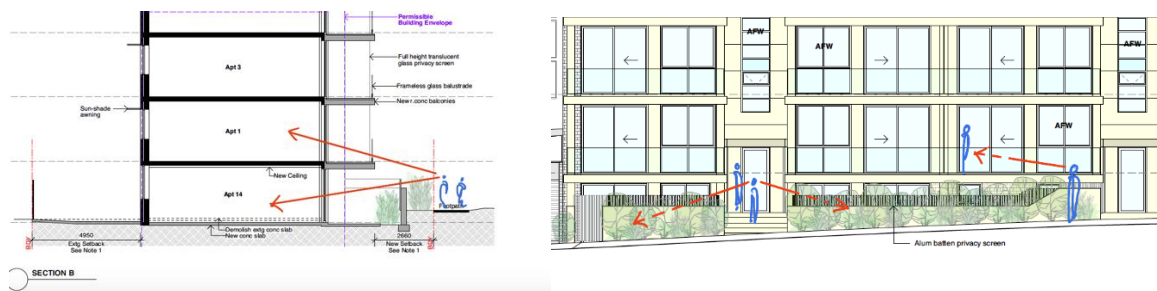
& 22: Proposed section and southern elevation with notations from Council's Design Excellence Panel – 10 Major Street, Coogee (Source: Ken Powell Architect)
